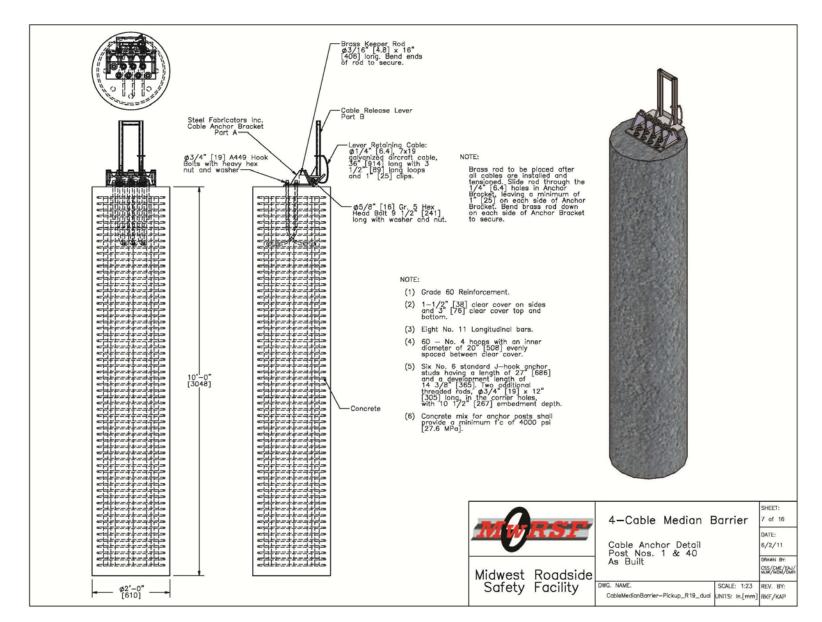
Cable Anchor Detail, Post Nos. 1 & 40, Test No. 4CMB-1
